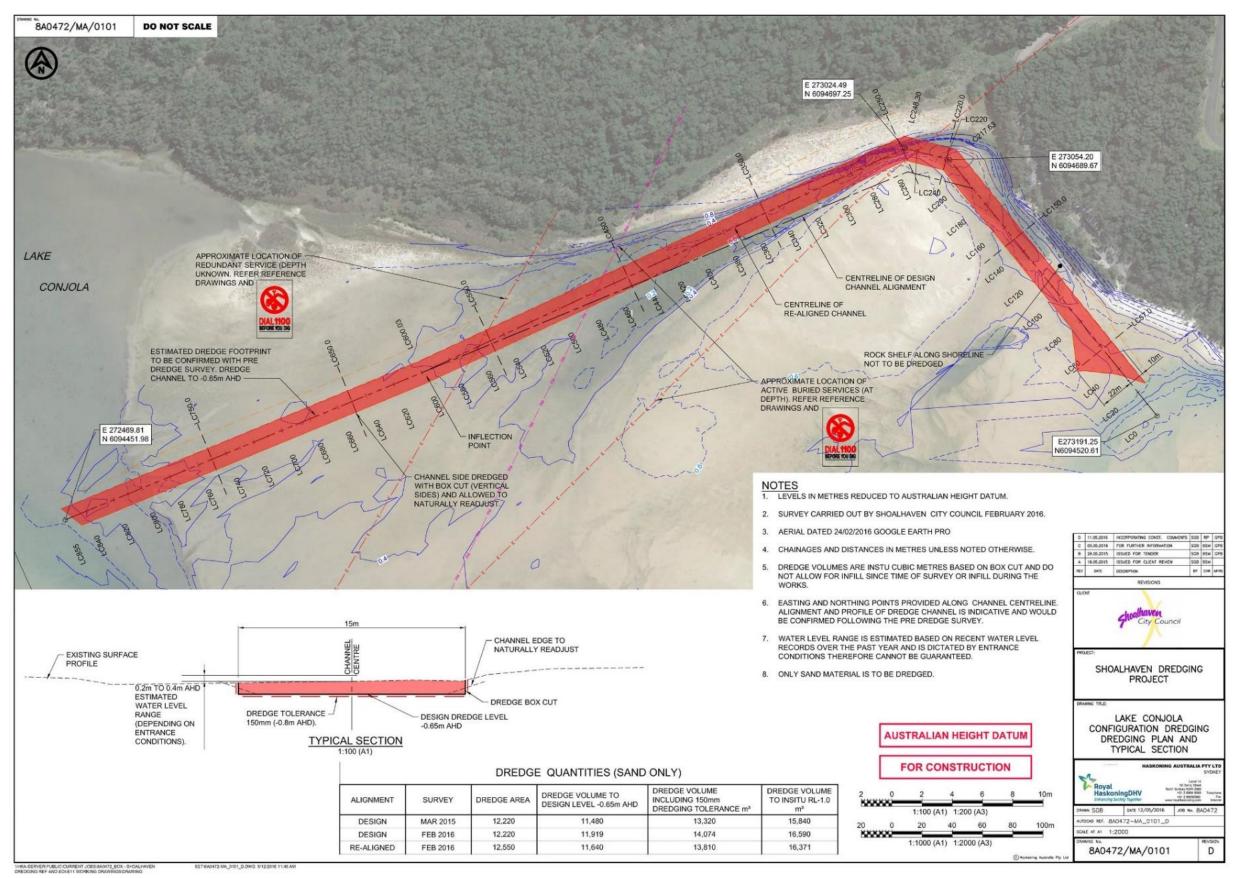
Dredging plan and typical section for navigation access dredging in 2016
